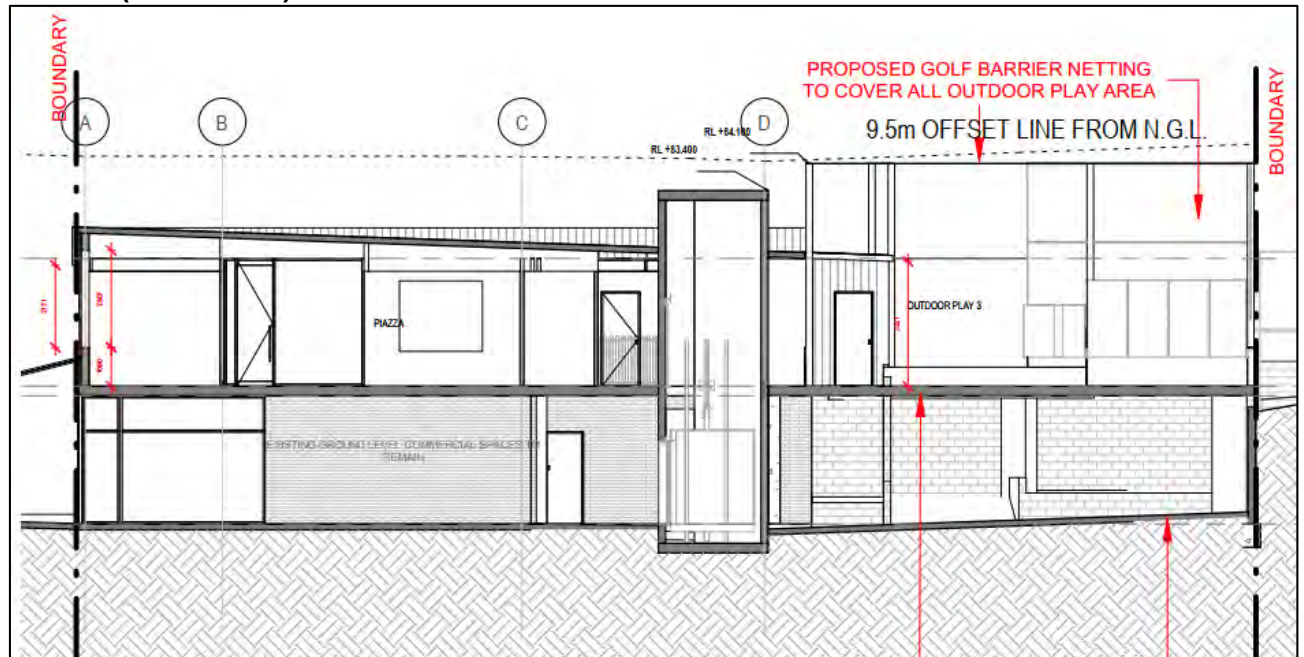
Proposed Detailed Section indicating the design of the front acoustic walls (left) and the rear acoustic walls.
